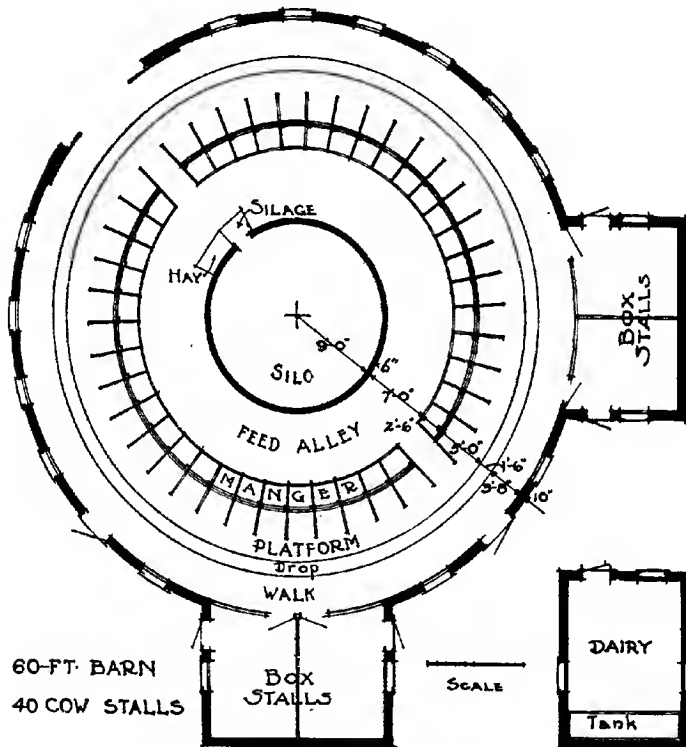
BOX STALLS ARRANGED UNDER THE DRIVEWAY APPROACHES TO THE SECOND FLOOR. THE DAIRY ROOM IS BUILT SEPARATE FROM THE BARN
